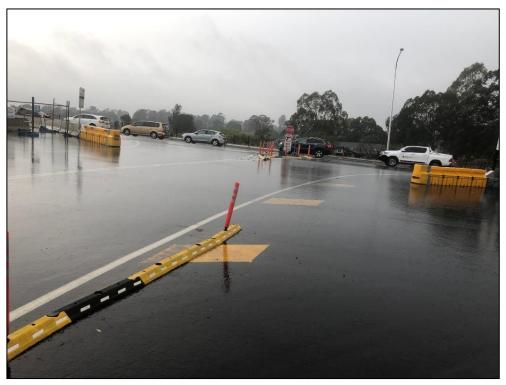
Stop intersection of The Northern Road with Garswood Road
